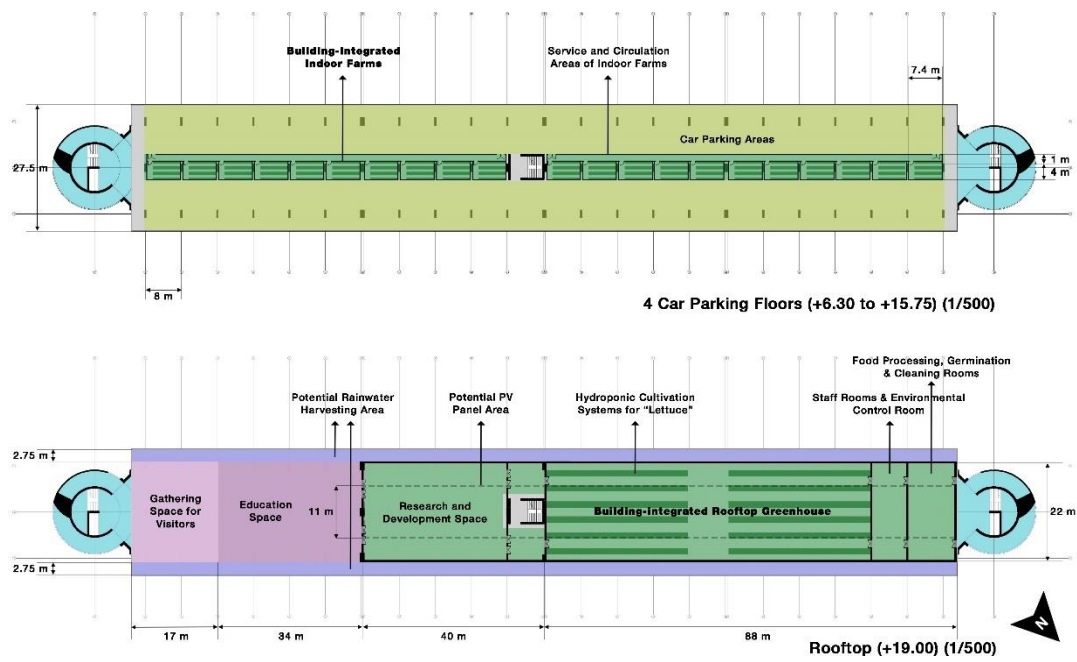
Proposed use of the car parking floors and rooftop of the building.
